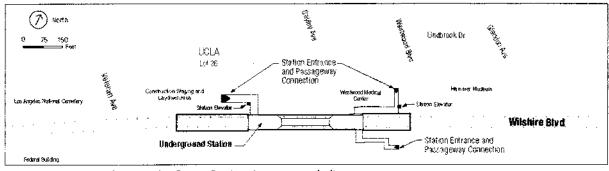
Westwood/UCLA On-Street Station (recommended)
